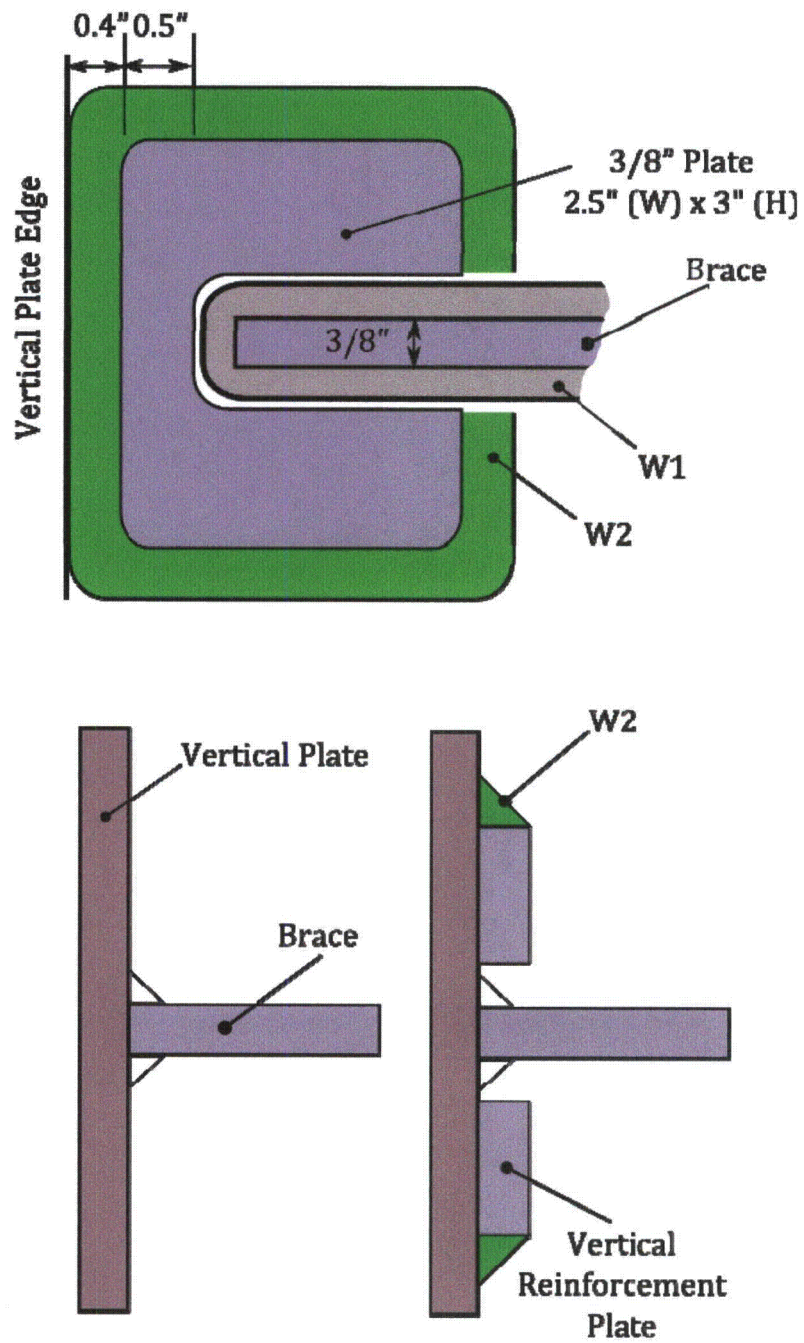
Schematic of reinforcement. W1 is the existing 0.25" weld; W2 is the new 0.375" weld for attaching the vertical reinforcement plate.
